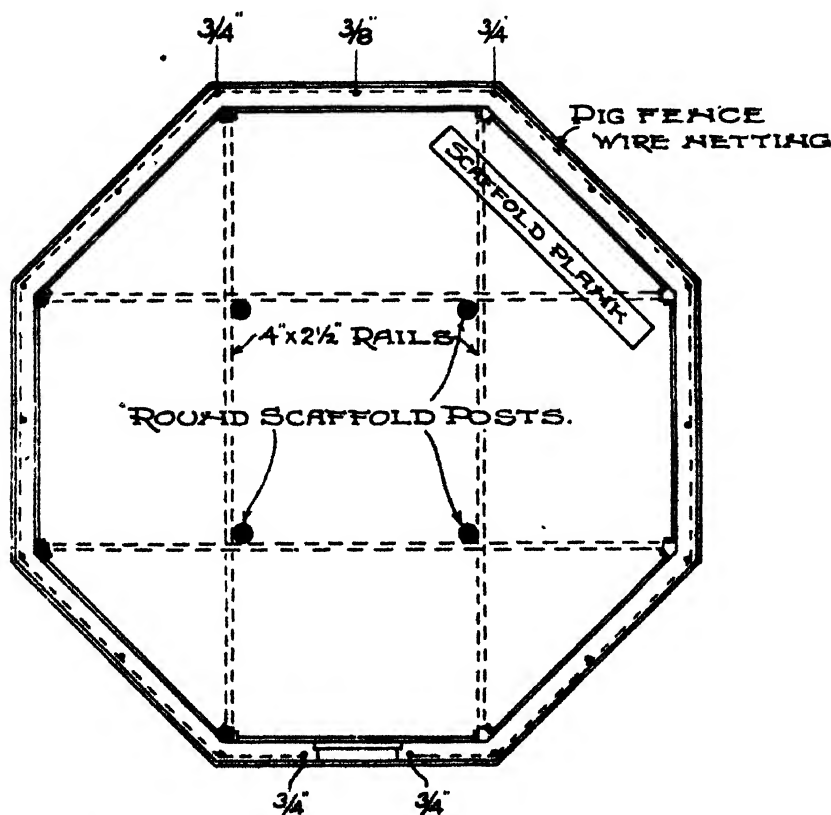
Plan of Octagonal Concrete Silo, showing Framing for Concrete.
